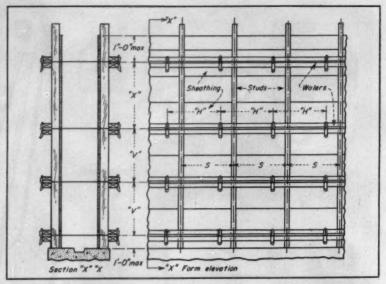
TYPICAL SPACINGS of ties and framing members for wall forms. Snap ties shown for light forms. Heavier ties must be substituted for 6,000 lb and over.
